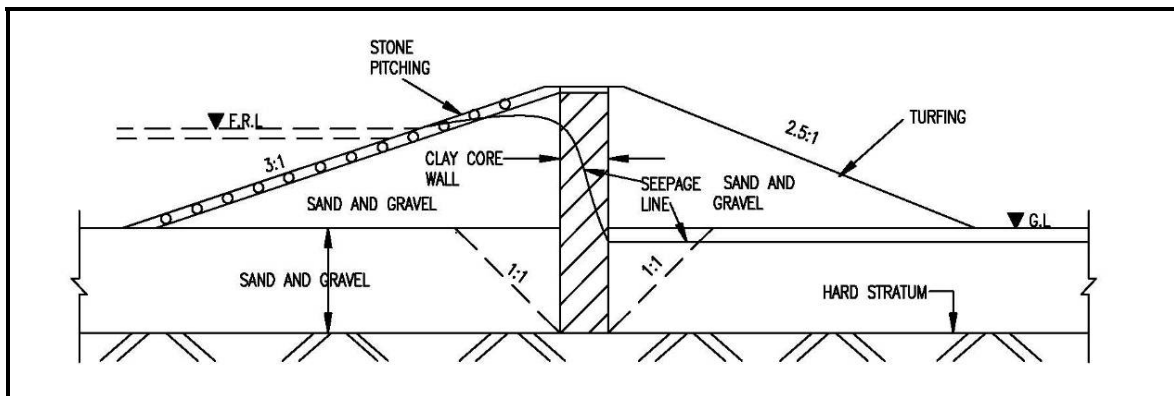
Typical Earth Dam Section with Foundation Pervious to Large Depth
